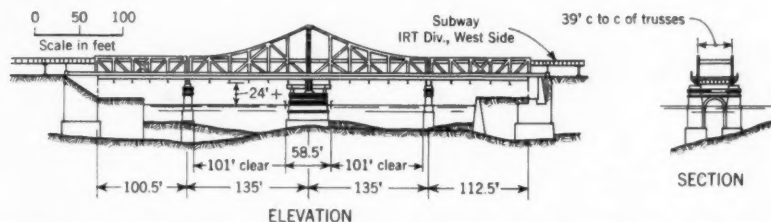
Original swing span, built in 1905, was supported on central pivot pier, providing two 101-ft clear spans.
